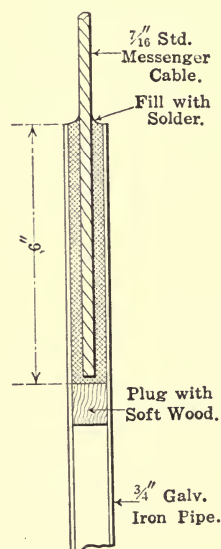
METHOD OF CONNECTING CABLE TO PIPE.
